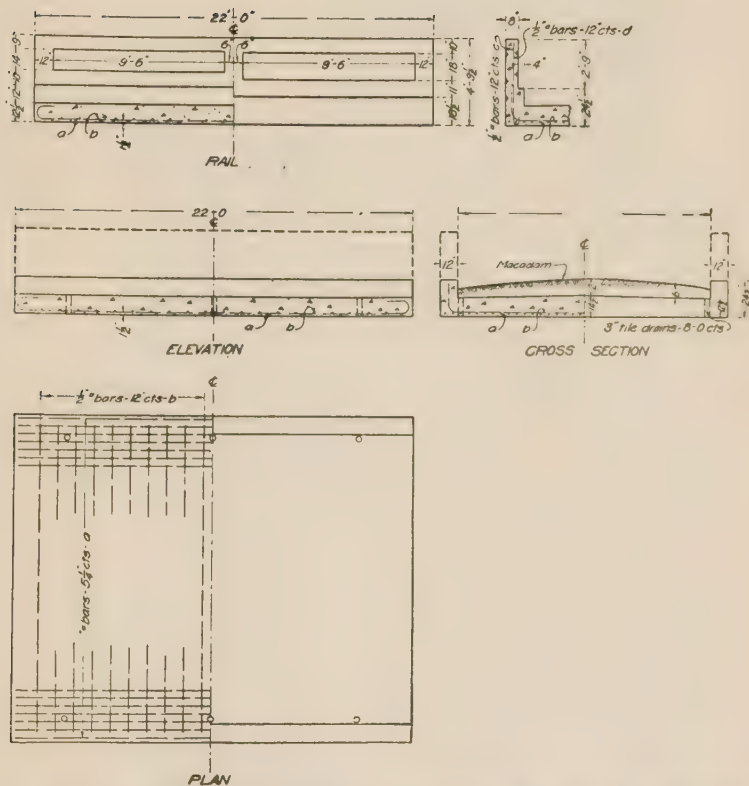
Reinforced concrete slab bridge, Illinois State Highway Department.
